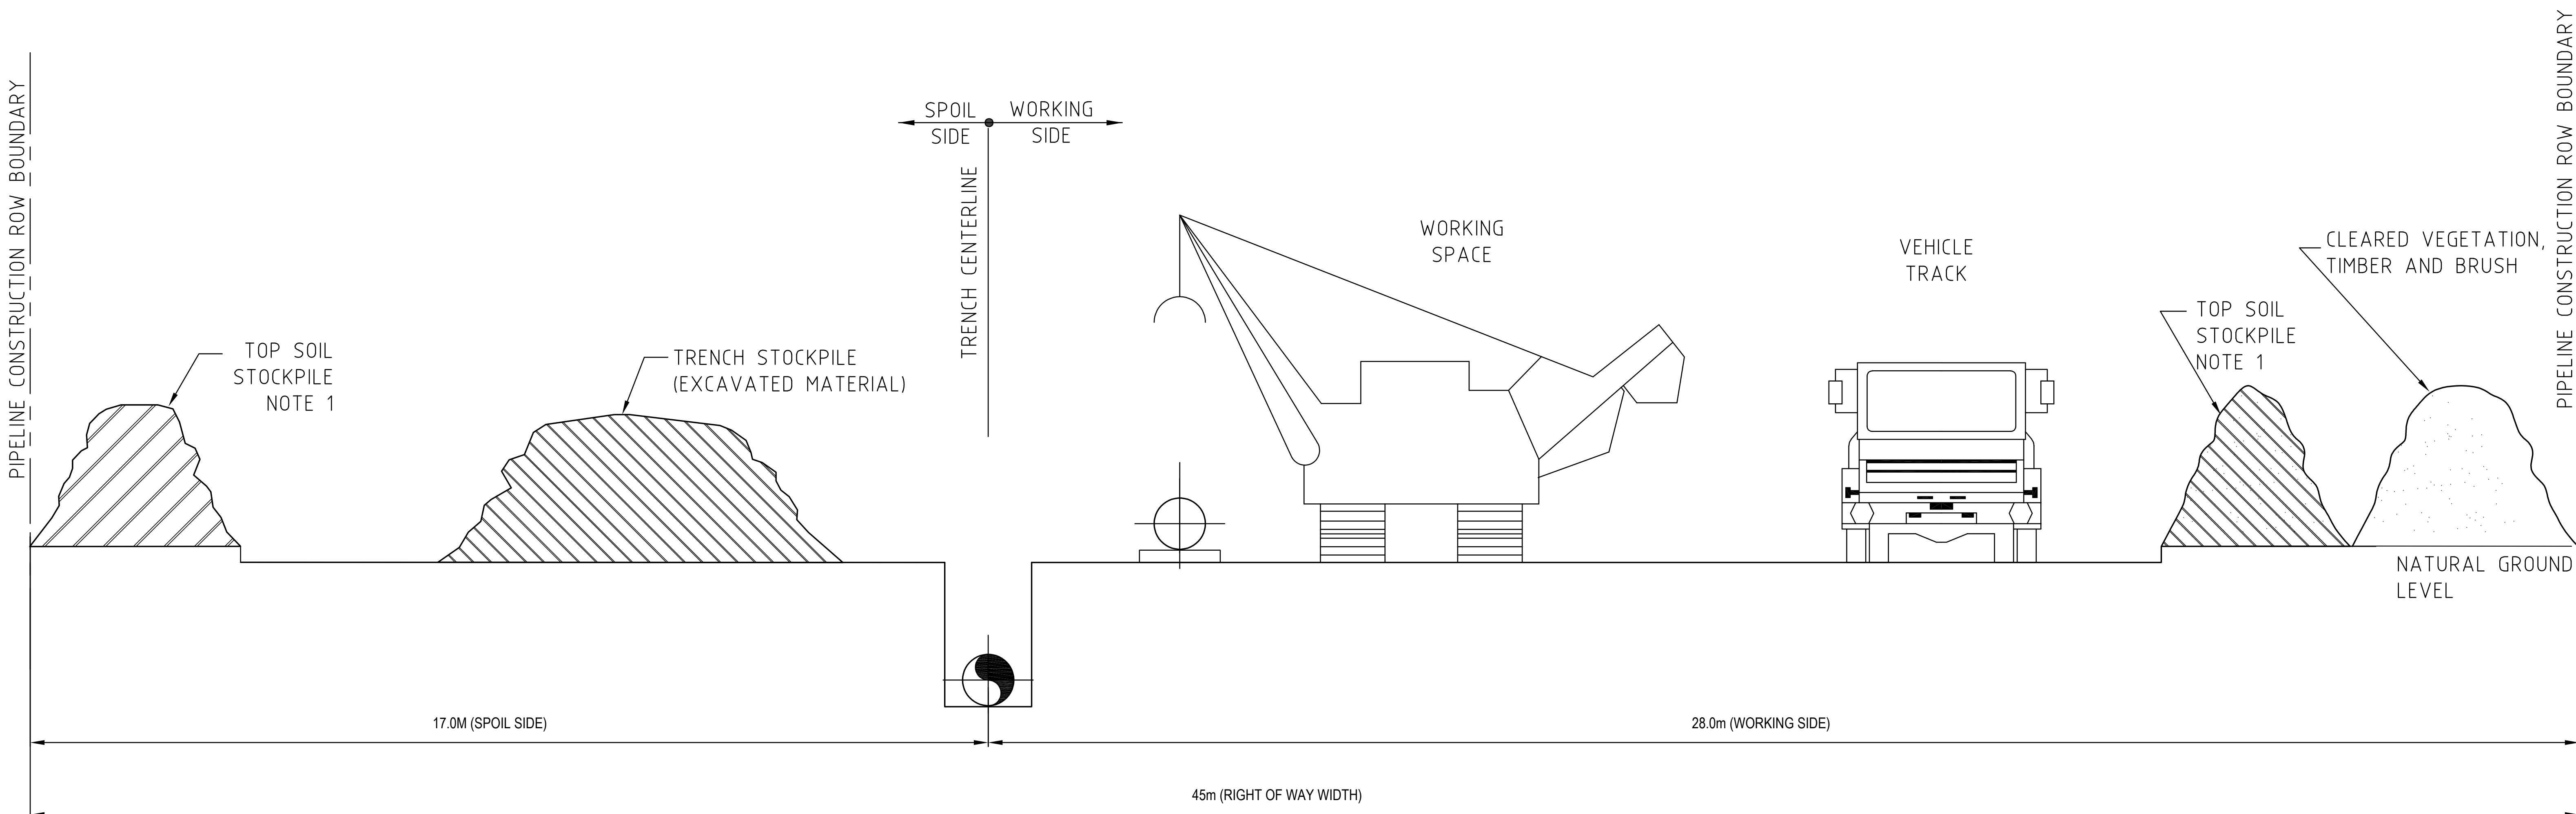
TYPICAL CONSTRUCTION ROW LAYOUT - CONVENTIONAL 45m WIDTH
